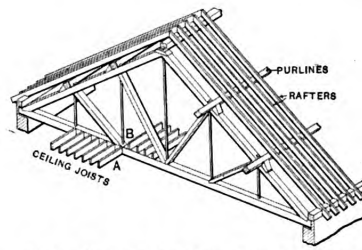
Showing how Truss Supports Purlins and Rafters.
